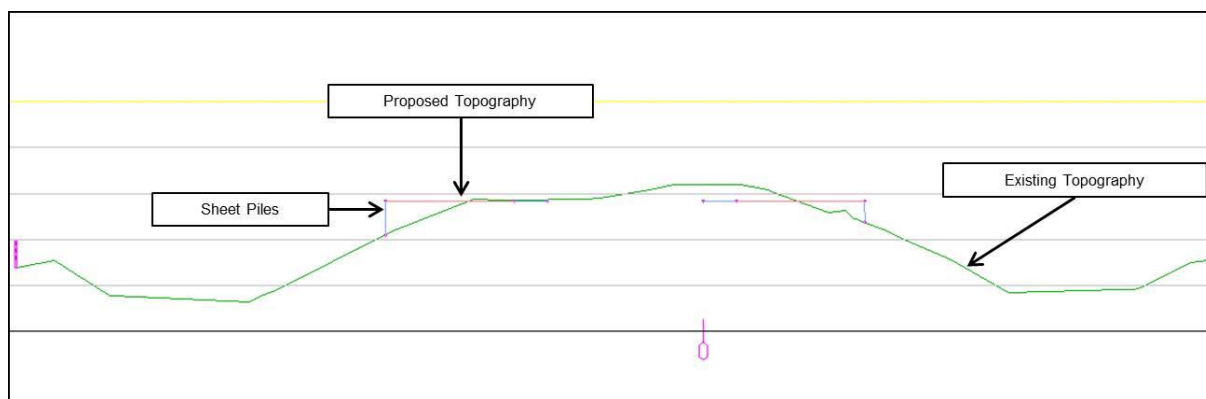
Typical Cross Section Representing the Sheet Piling Earthwork Stabilisation Solution.
